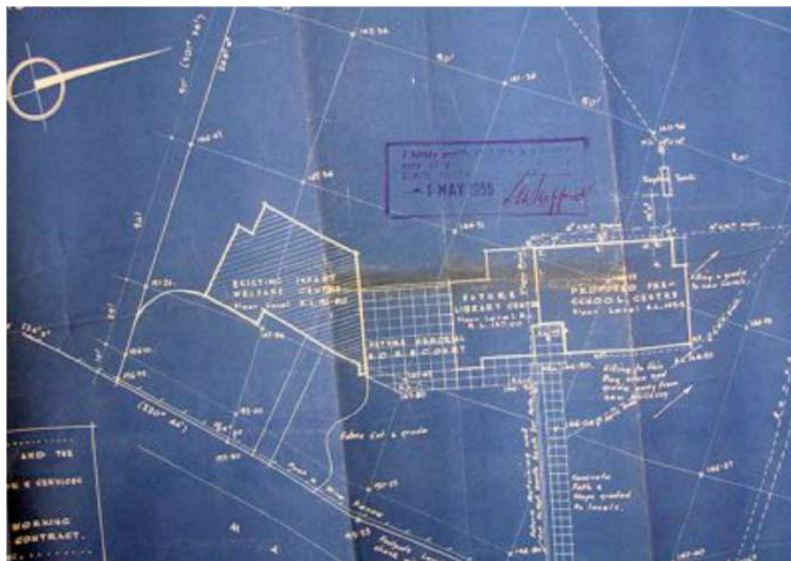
Sketch site plan dated 1956, showing amendments to postpone construction of the library and reductions to spaces in the Pre-School building. (Source: Public Building Plans File No.5841 Plan No.4057, Unit 413, VRPS 8044, PROV, cited in Mills and Westbrooke 2010:13)
